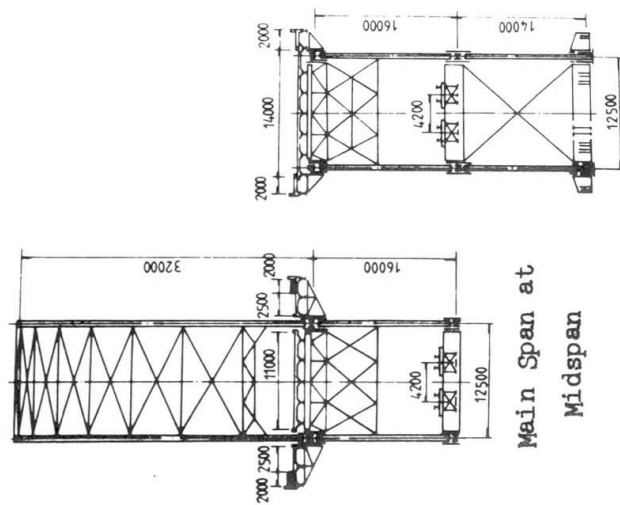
General Layout of Steel Truss of Bridge Proper (m)
